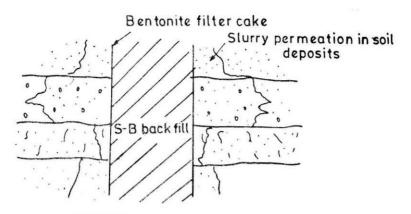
Cross Section of S-B Slurry Trench Cut-off
